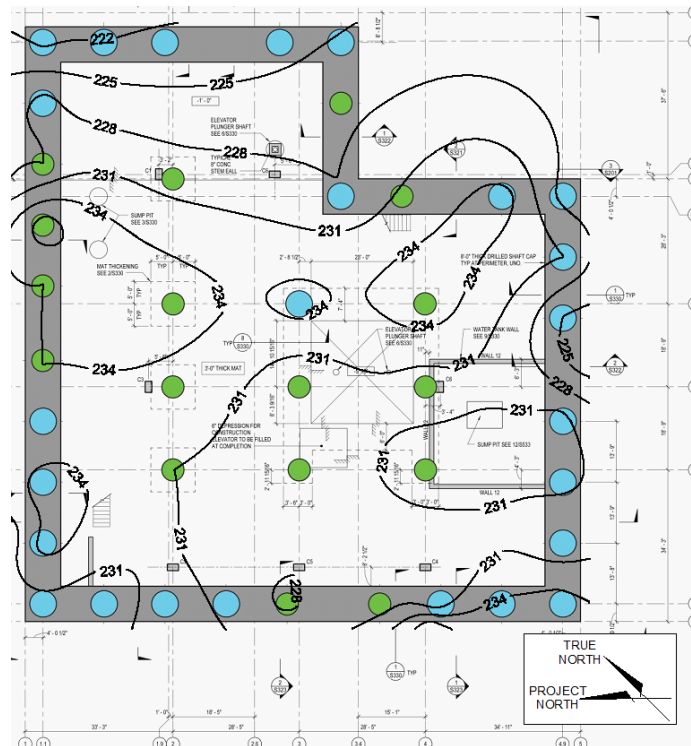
Plan view of deep foundation system and depth to bedrock contours in feet
